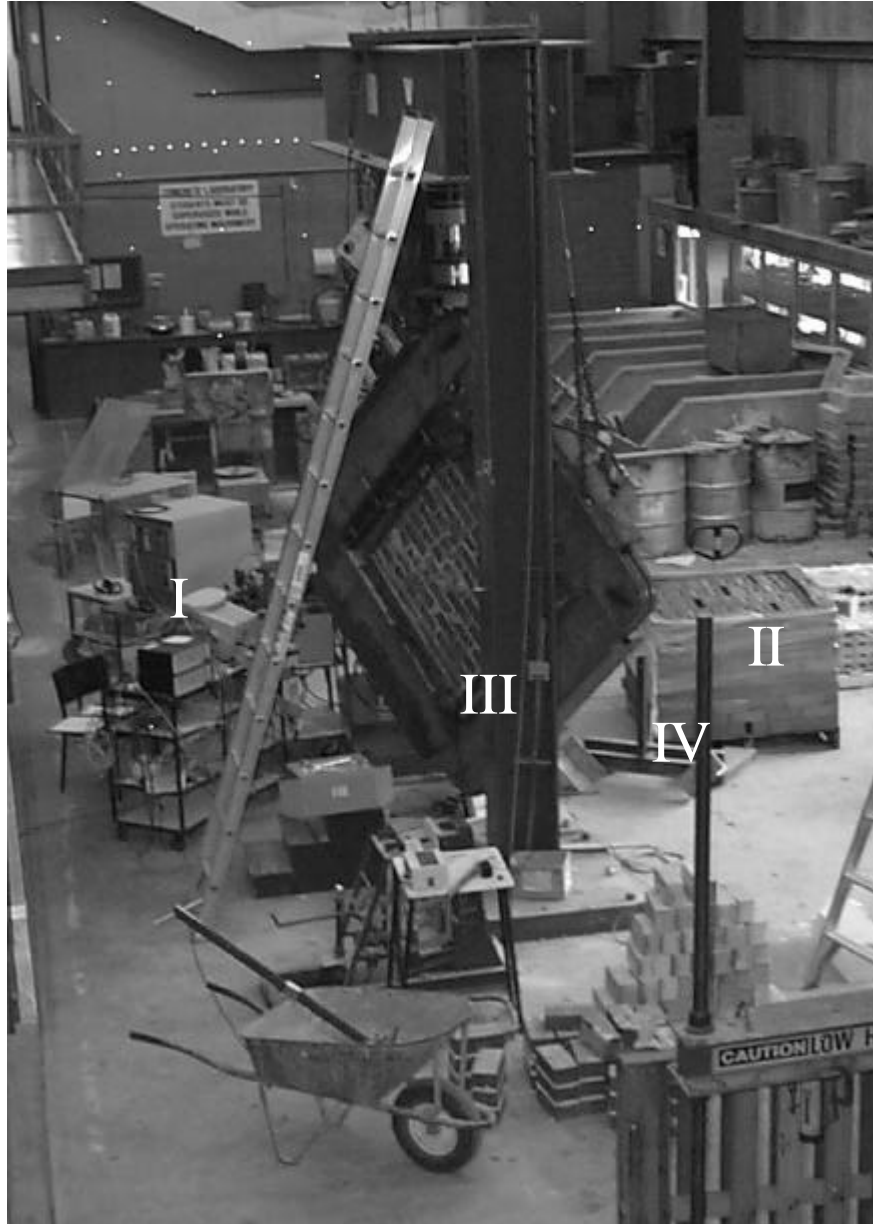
REACTION FRAME AND STRONG FLOOR WITH HANGING RIG
